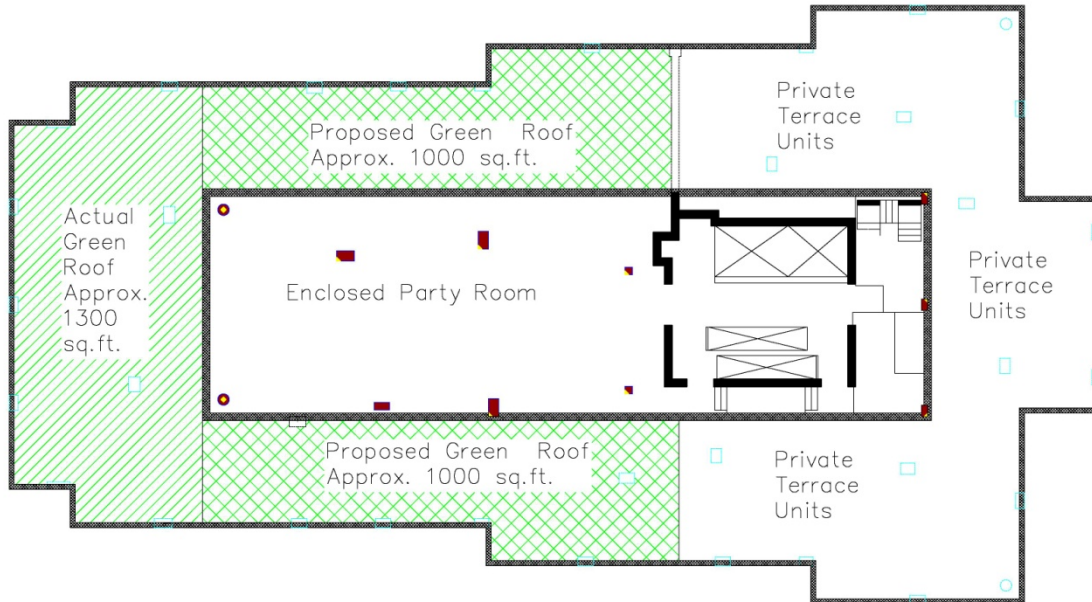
Roof plan for Southtown Building No. 5. Actual green roof and proposed green roof areas can be seen in the different green hatching.
